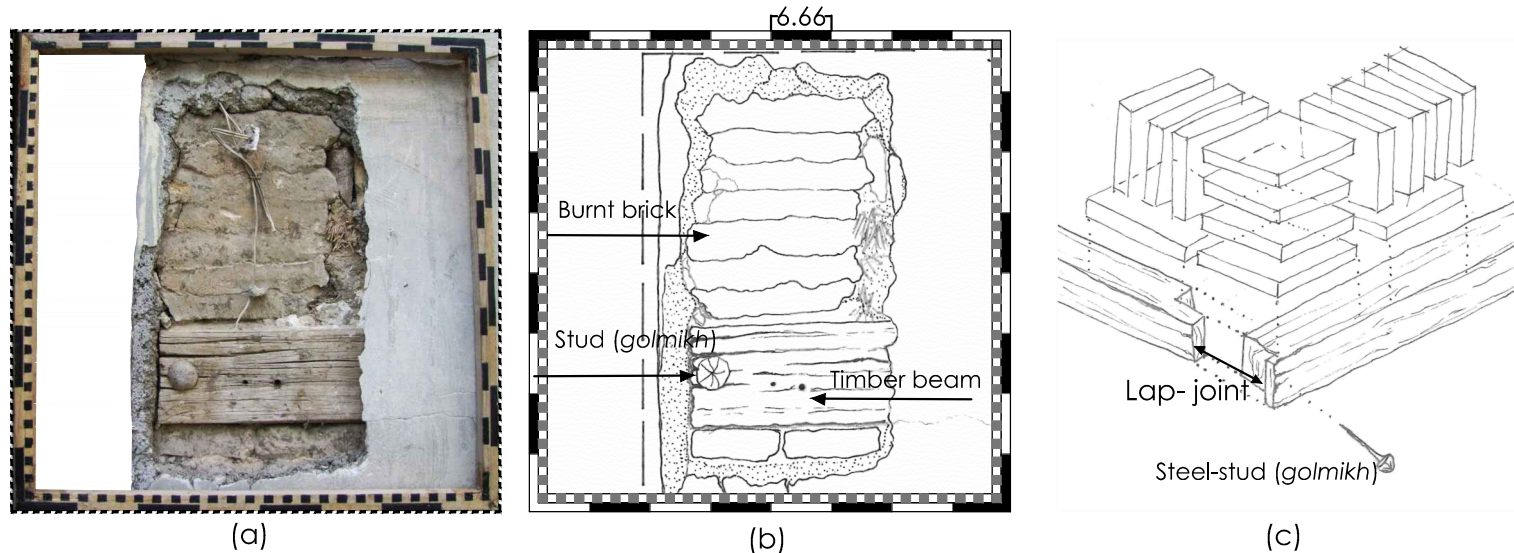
Construction of fired-brick masonry; (a) as the demolition of Bidari House was expected, the author decided to remove a thick layer of white cement that had covered the façade to discover construction materials and methods, (b) use of local materials such as timber beam (10 cm), fired kiln bricks (19 × 19 × 4 cm) and mixture of wet mud and straw, (c) combination of lap joint and steel decorative stud (*golmikh*) to provide a stronger connection between the horizontal beams.
